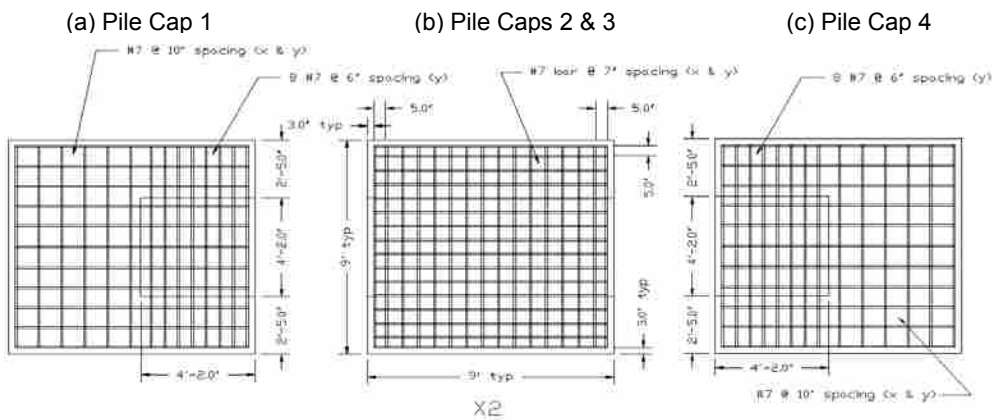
Layout of top reinforcing mat for the test pile groups.
